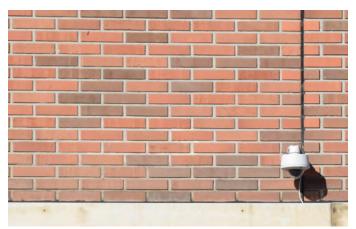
Sinsenveien 53 - Facade detail, Own photo
